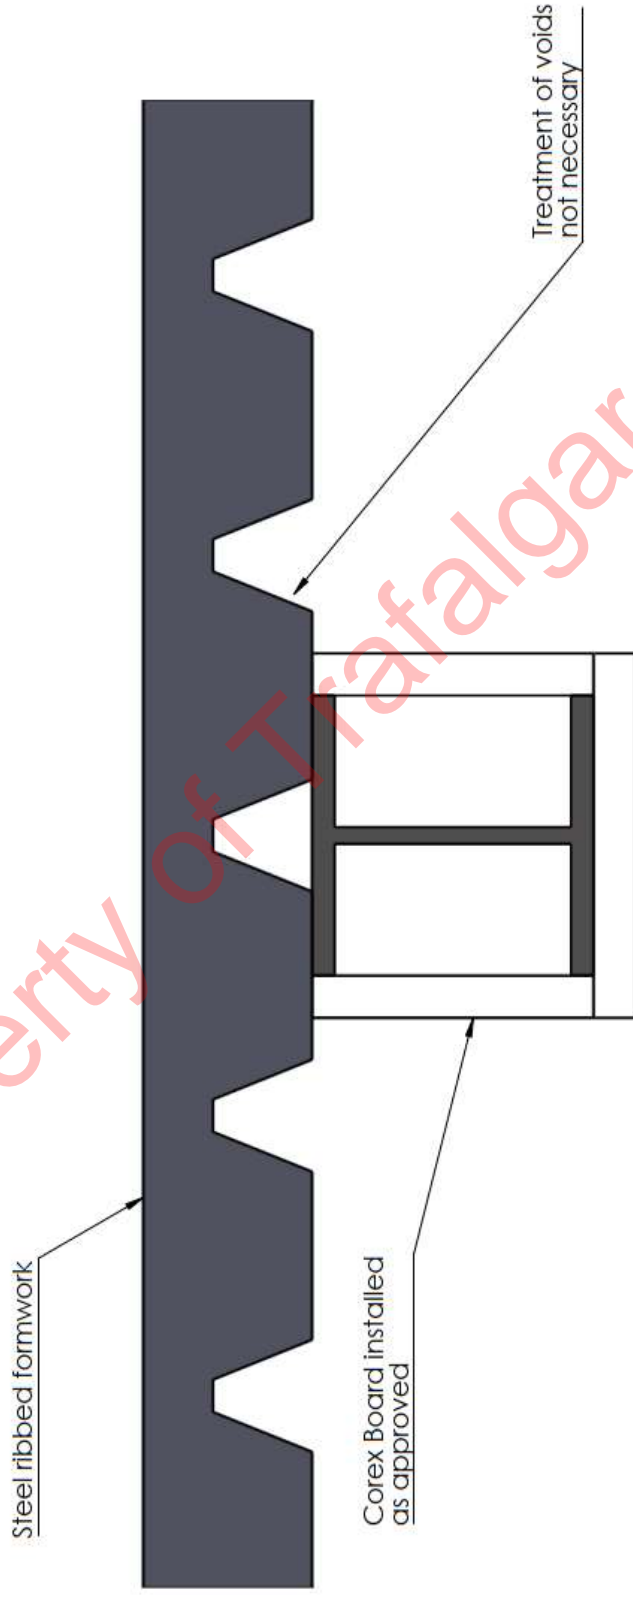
The construction detail of protected beam parallel to the voids of a composite floor slab with ribs (< 40 mm)
